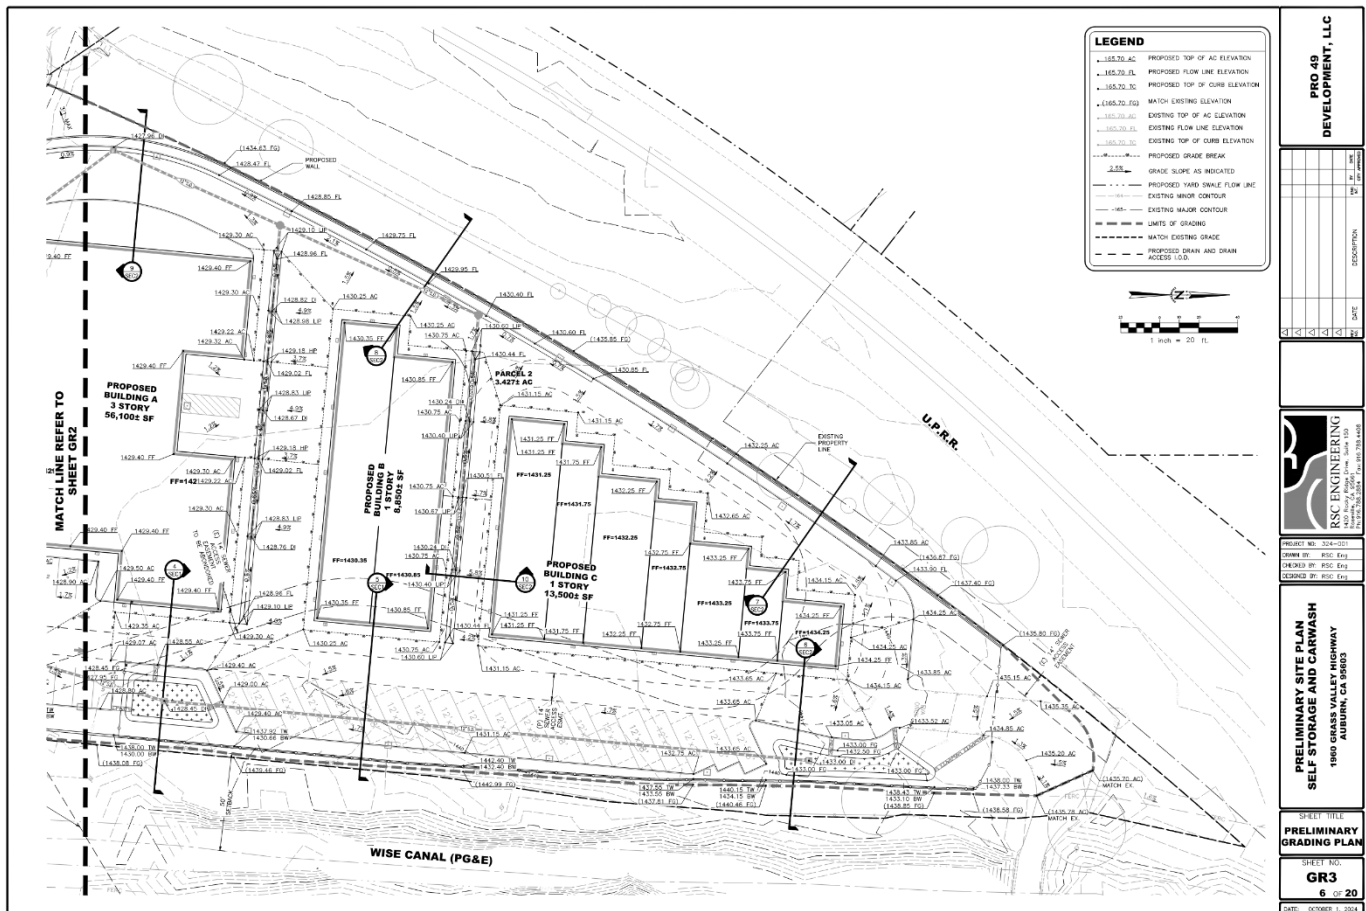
Locations of the Exploratory Borings Underlain by the Project Site Plan
